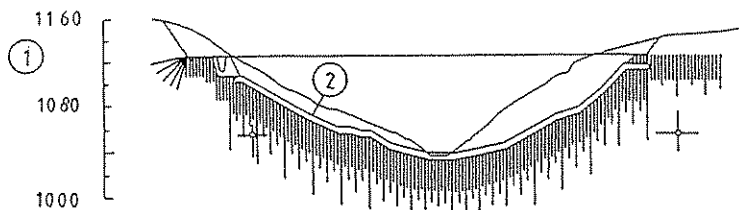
Inamura dam, Japan 1982. Well shaped core foundation after deep excavation of soil and weathered rock (adapted from Nakayama et al. 1982).
